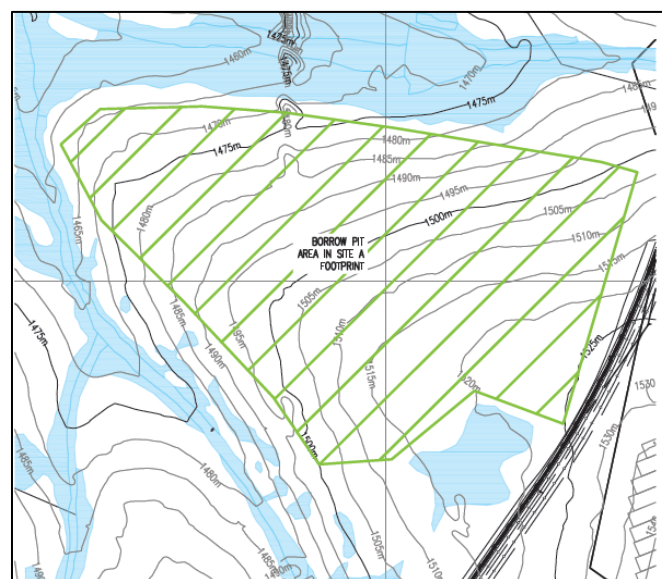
Borrow pit area for Site C located on Site A footprint
